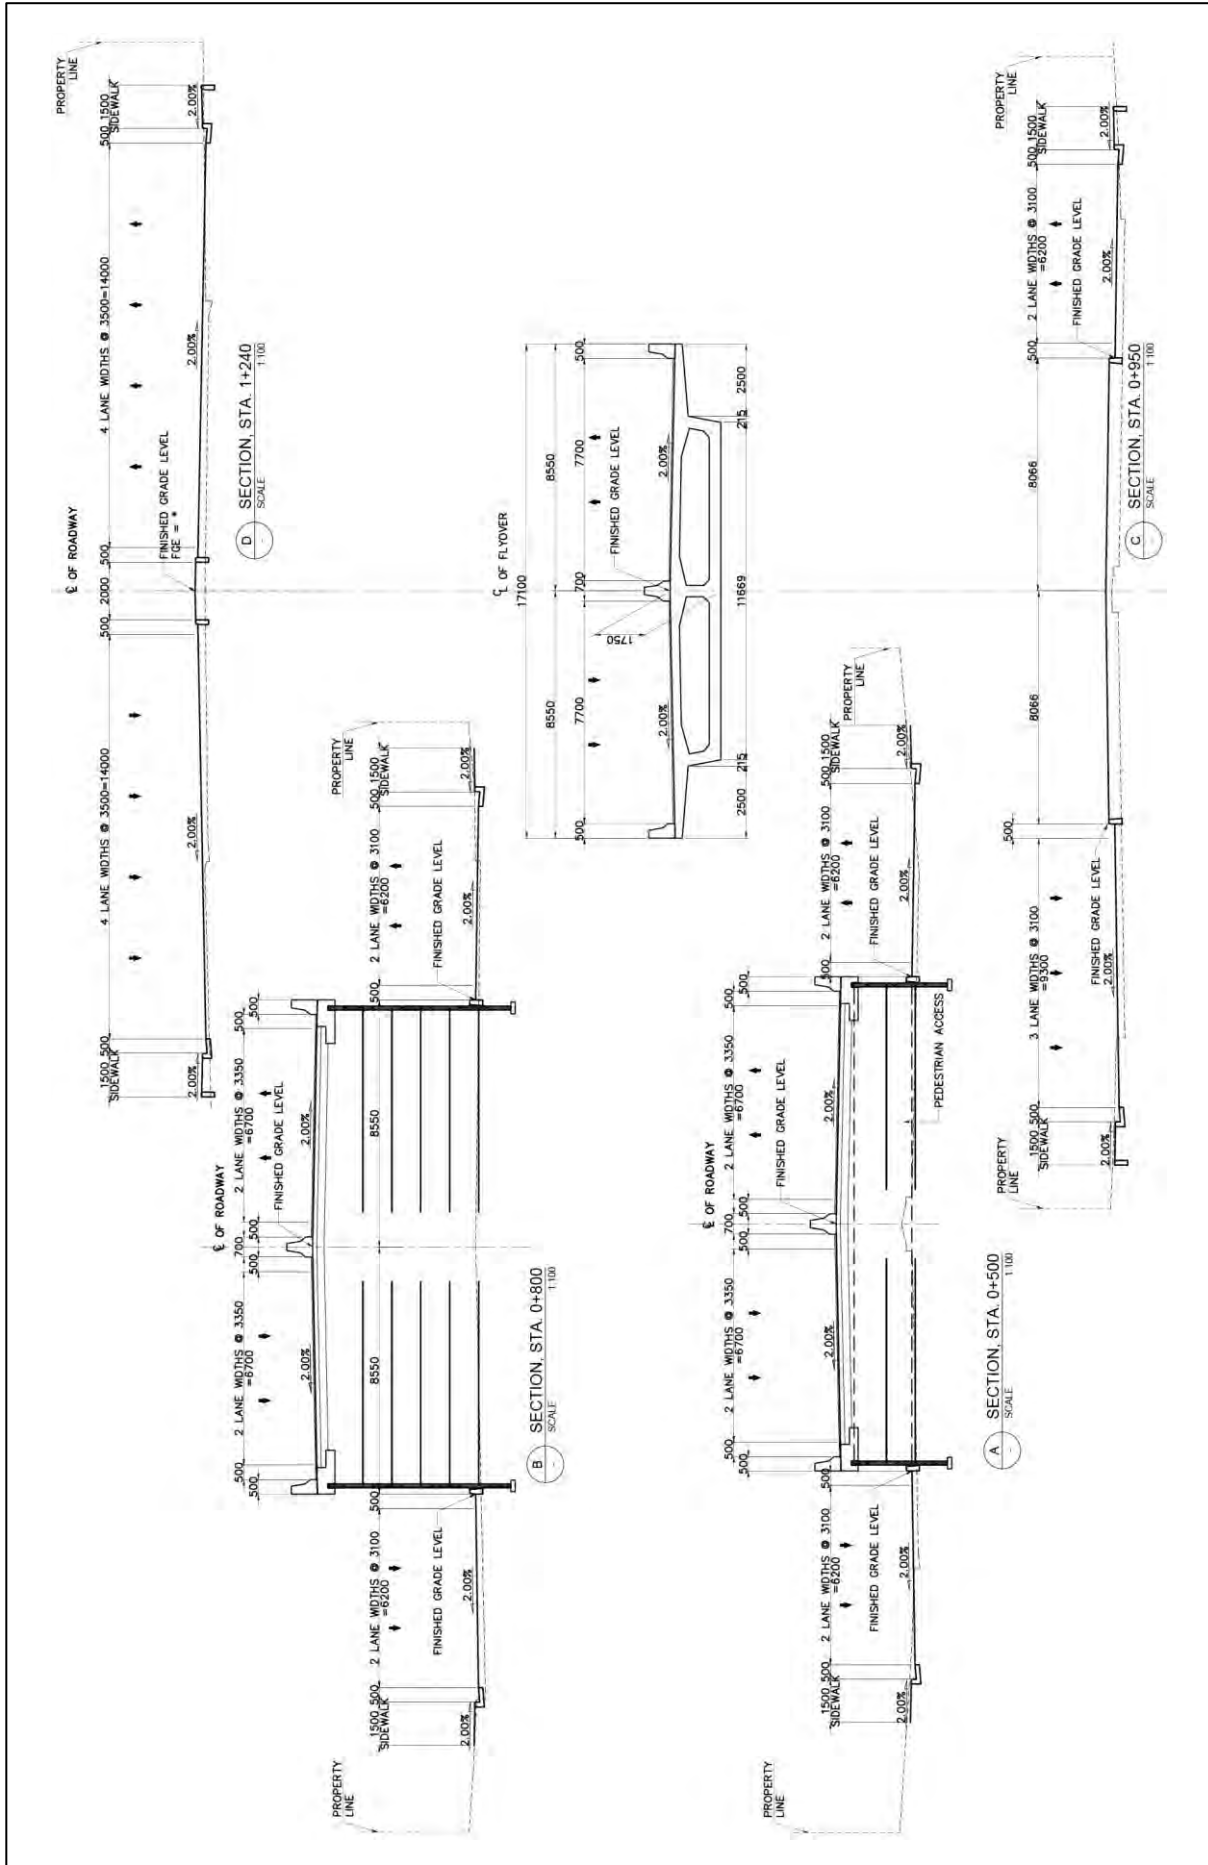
Approach Typical Cross Sections (C-3/E, Rodriguez Interchange)
